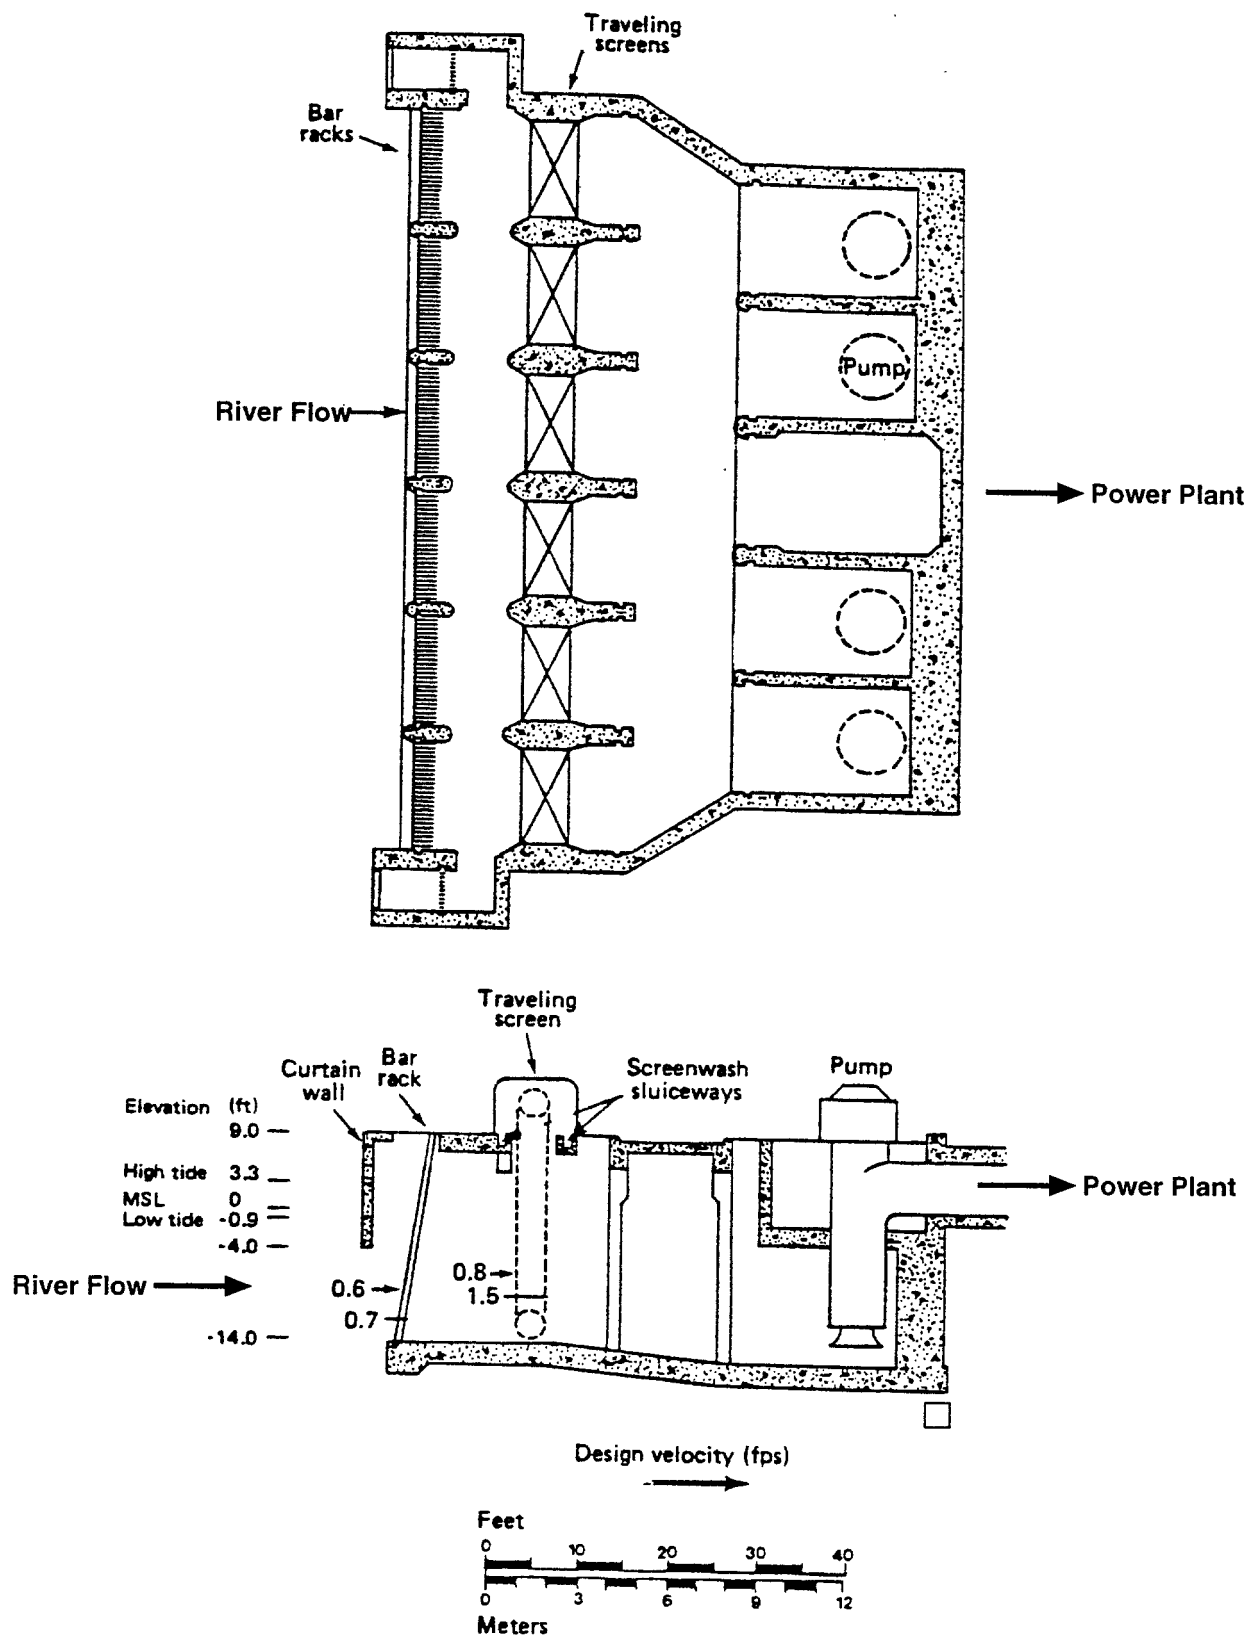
Plan and section schematic diagrams of Contra Costa Power Plant Units 6 & 7 intake structure.
